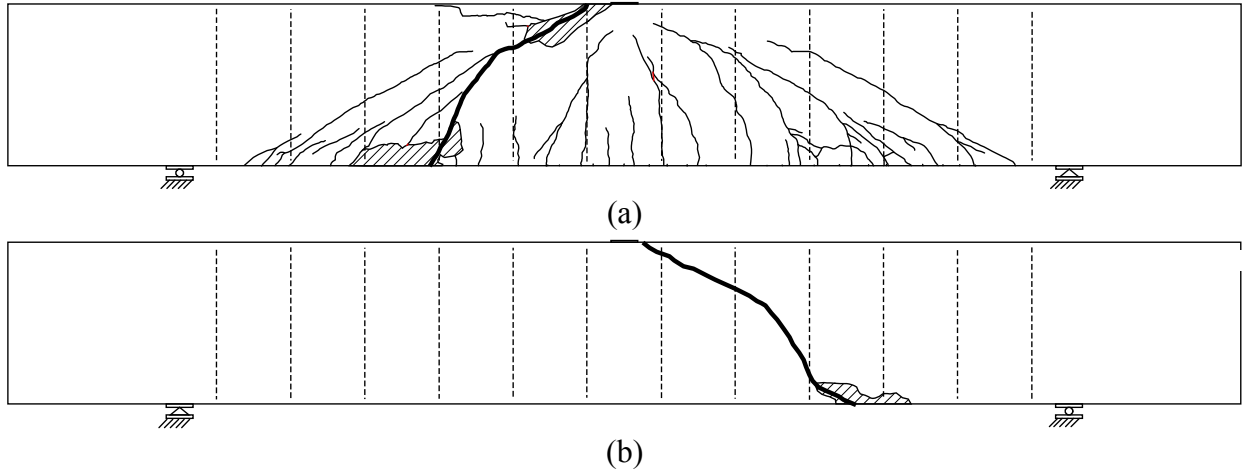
Observed damage in specimen P2S9, (a) front side, (b) back side
